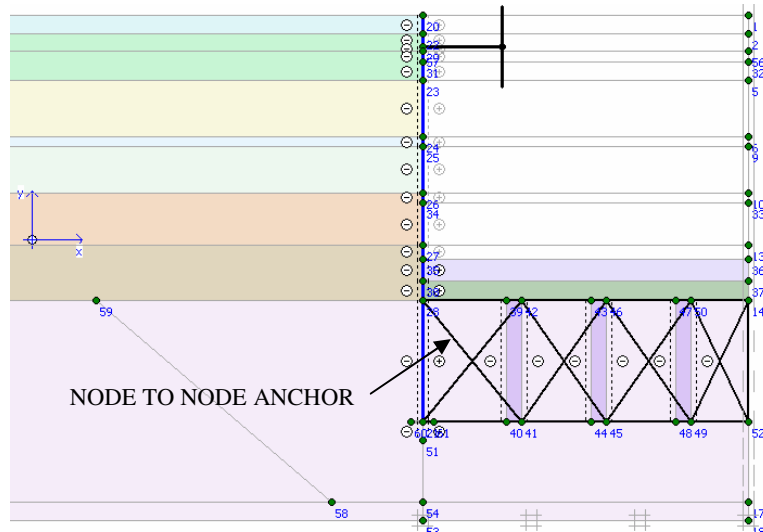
Alternative A: NODE TO NODE ANCHOR to diaphragm wall.
